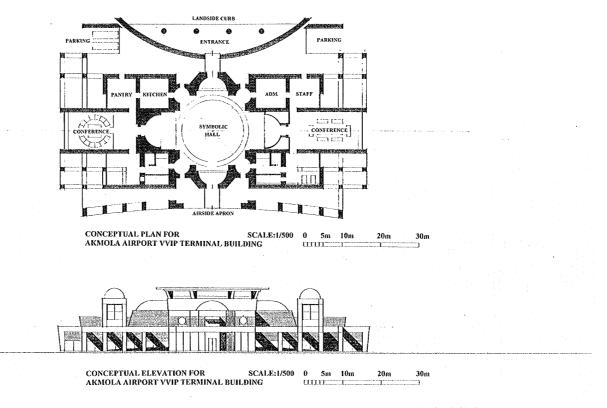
VVIP Terminal Building - Plans and Elevation
